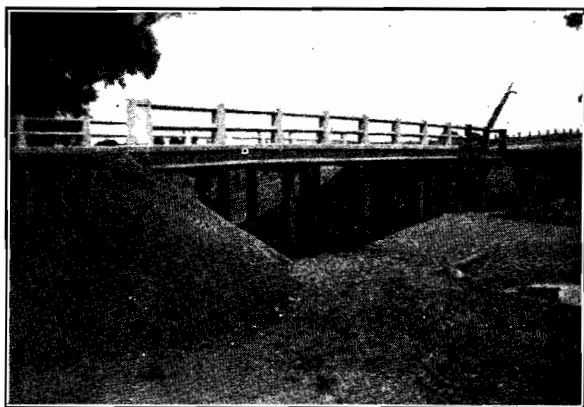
New concrete bridge on Murray Valley Highway, east of Yarrawonga.
